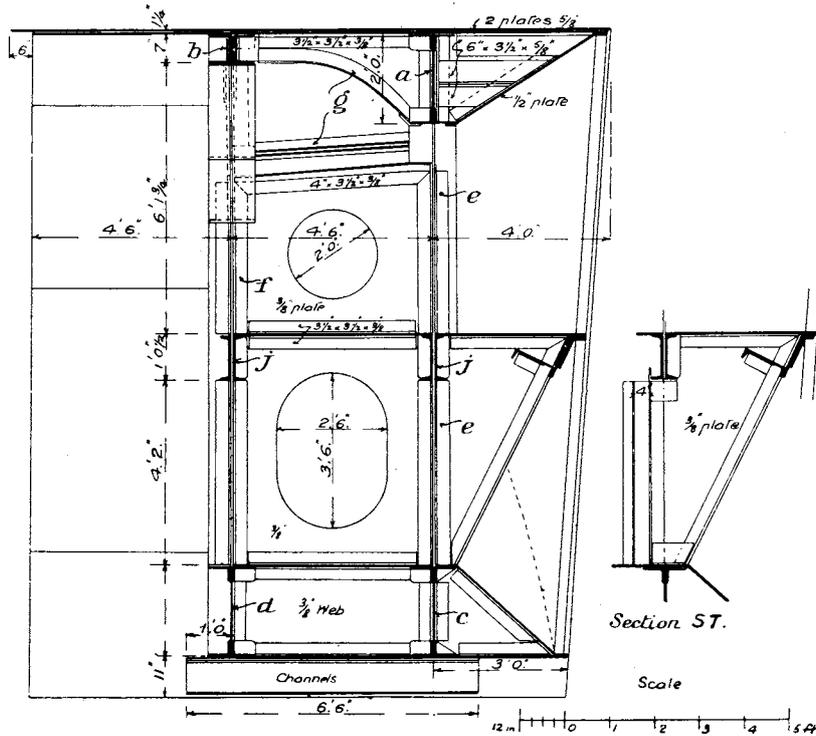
UNDERGROUND RAILWAY, BOSTON, U.S.A.
